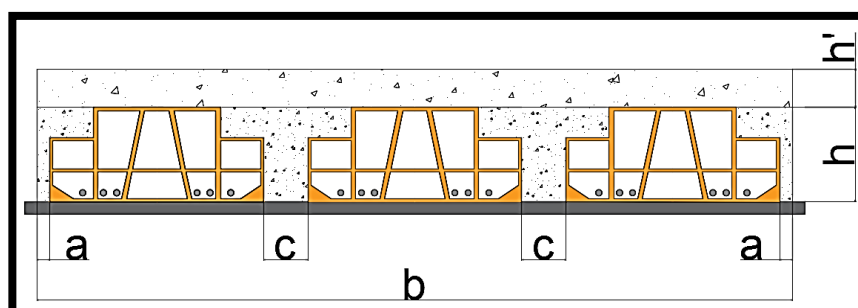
Design of the cross section of the consolidated floor slab. (Source: Own design)
